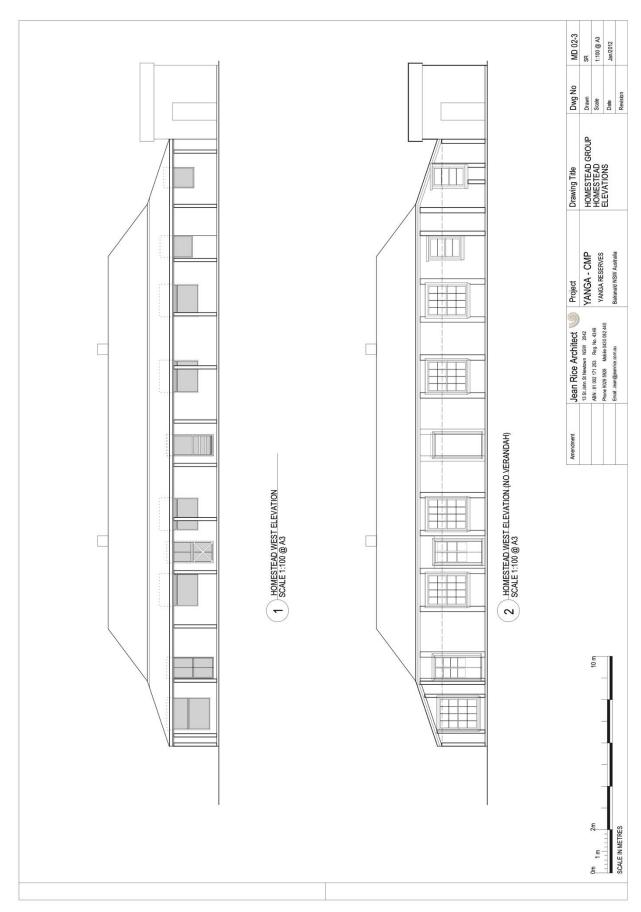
Homestead Group Main Building Elevations. Jean Rice Architect, site assessment 2009.
